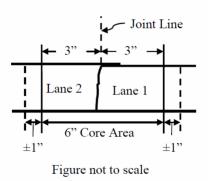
Cross-sectional View, Position of Core Along Longitudinal Joint, Imperial Units
